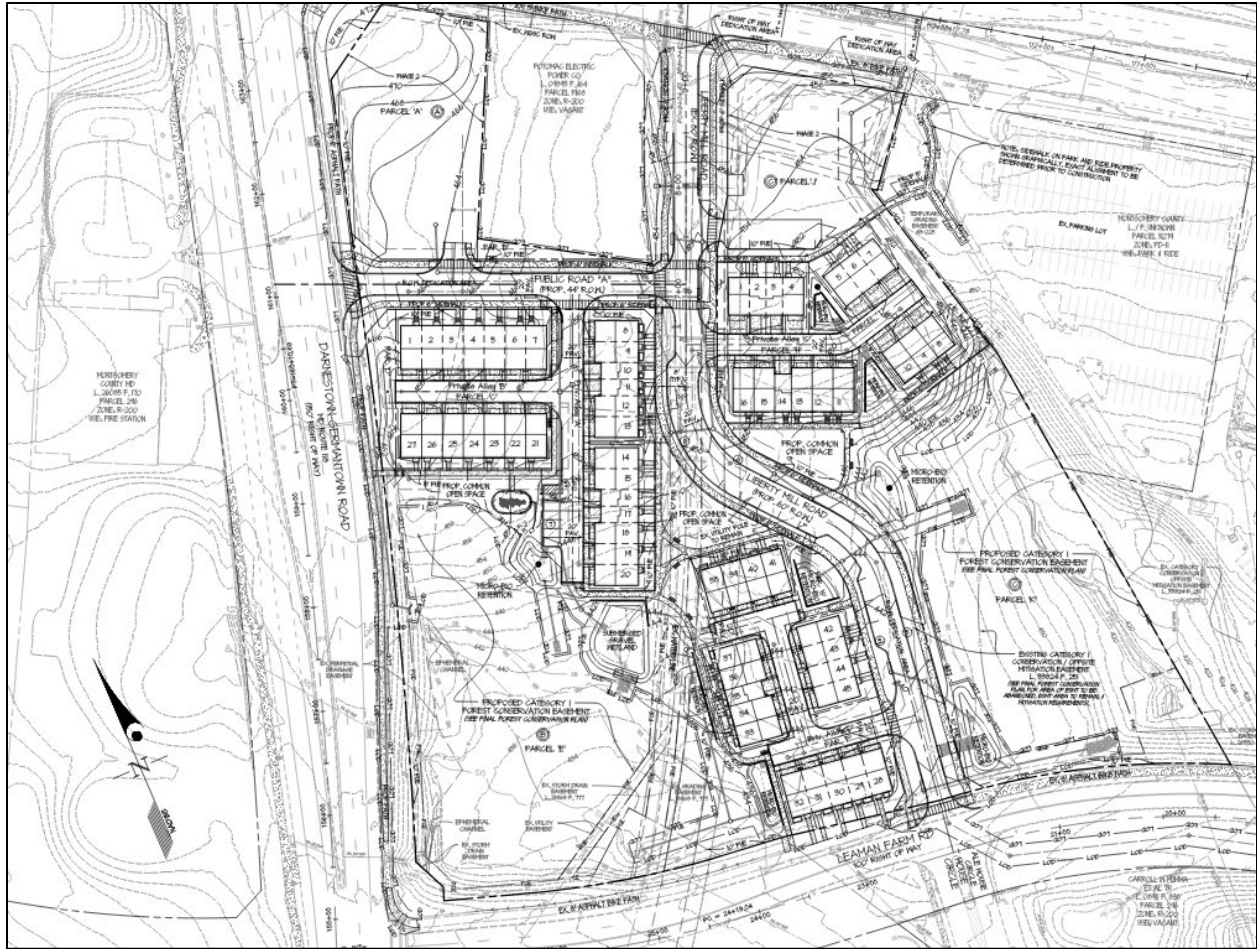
Application for Kingsview Station, Preliminary Plan 120210210 and Site Plan 820210130
